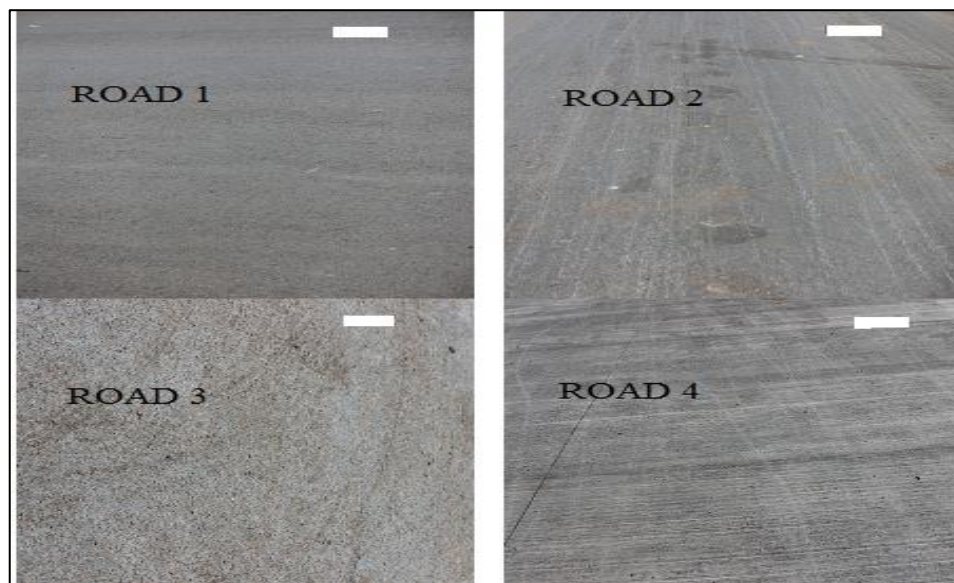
Schematic diagram showing the test sections selected for noise measurements
